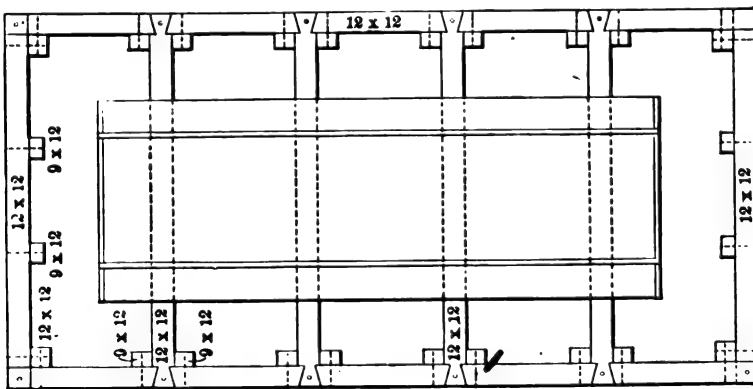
ARNPRIOR BRIDGE, CRIB AND COFFER-DAM, CANADIAN PACIFIC RAILWAY.
